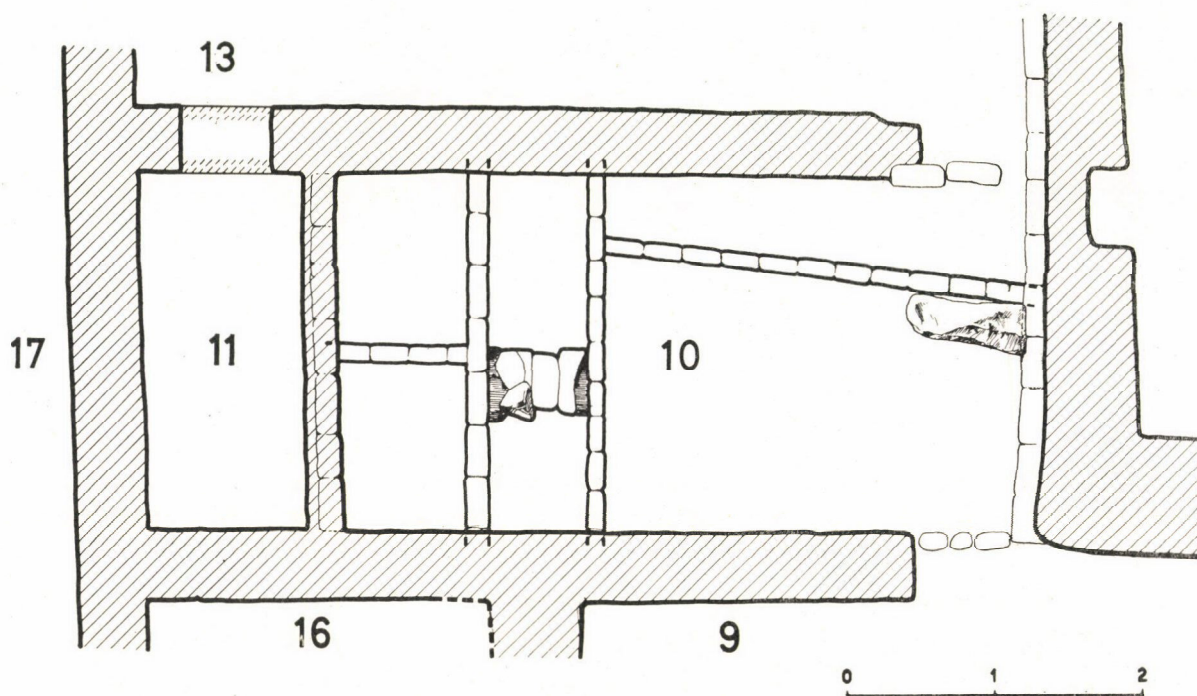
C/I, ground-plan of rooms Nos 10 and 11
